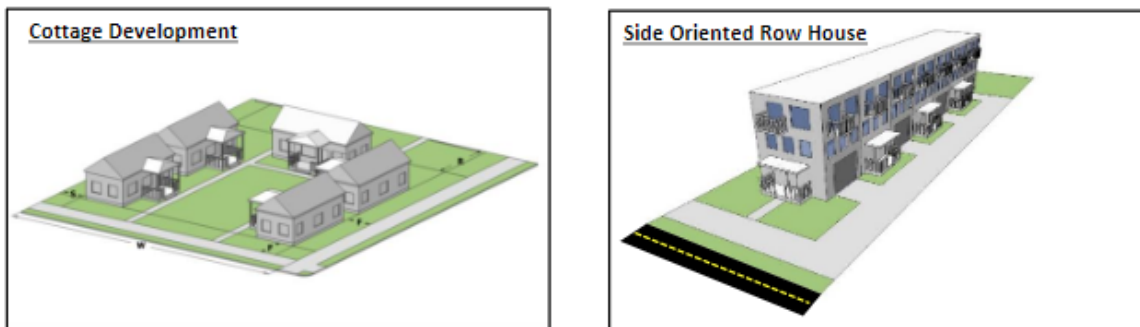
New Building Forms Proposed in Multi-Family Residential Zones (City of Salt Lake, 2019b)
